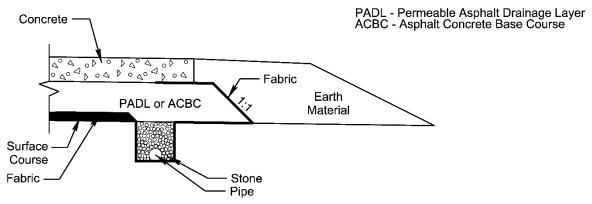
Pavement Edge Construction with Shoulder Drains
